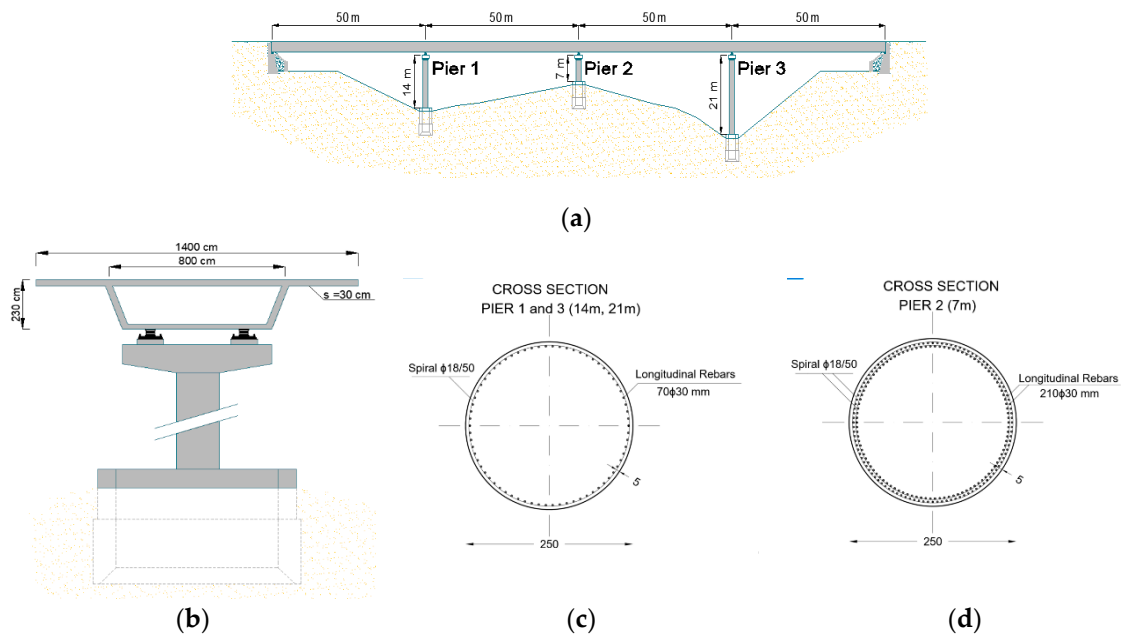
Structural details of selected bridge: (a) longitudinal view, highlighting the piers and span length; (b) bridge pier, elevation view; bridge pier cross-sections: pier 1 and 3 (c), pier 2 (d).
